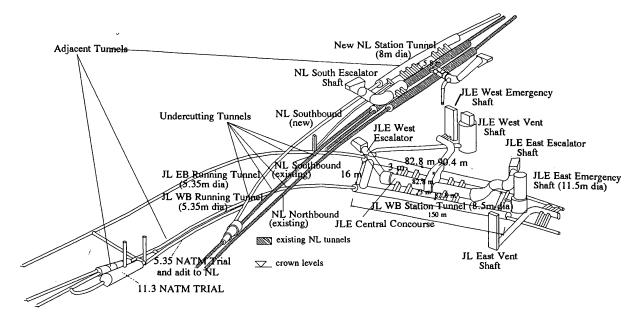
A 3 dimensional plan of tunnel construction for C104 - London Bridge Station
